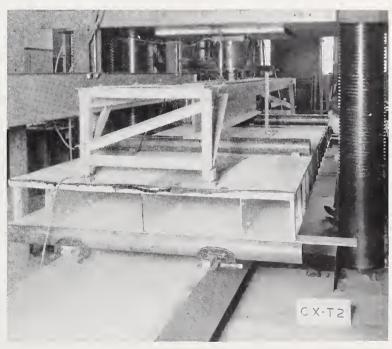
Roof specimen CX-T2 under transverse load.
